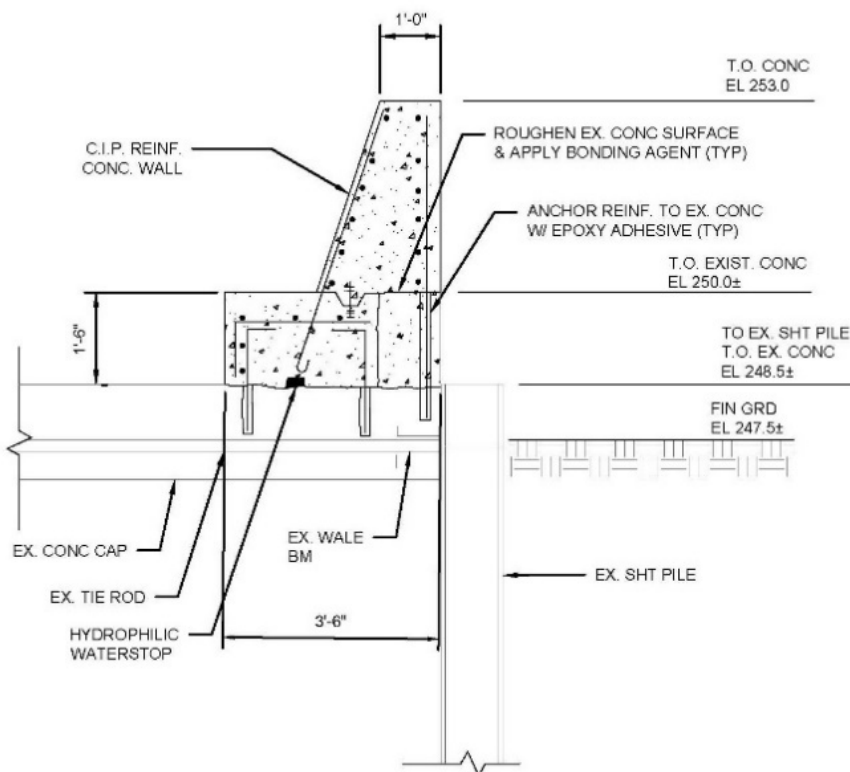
US Coast Guard Station: Flood Wall along Dock Typical Detail
